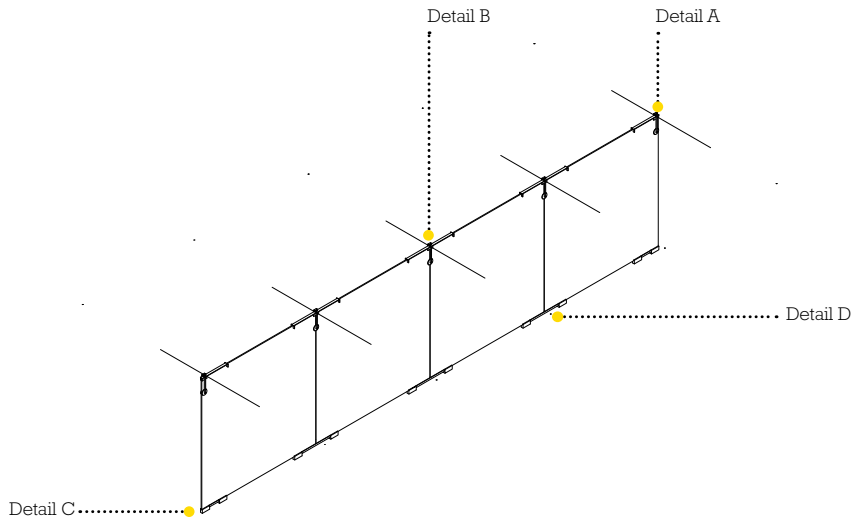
Construction detail - Exhibition wall of the exhibit | Axonometric view.
